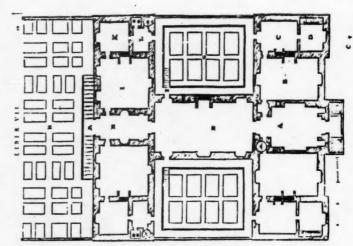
House plan after Serlio, (Architettura, Book VII)
